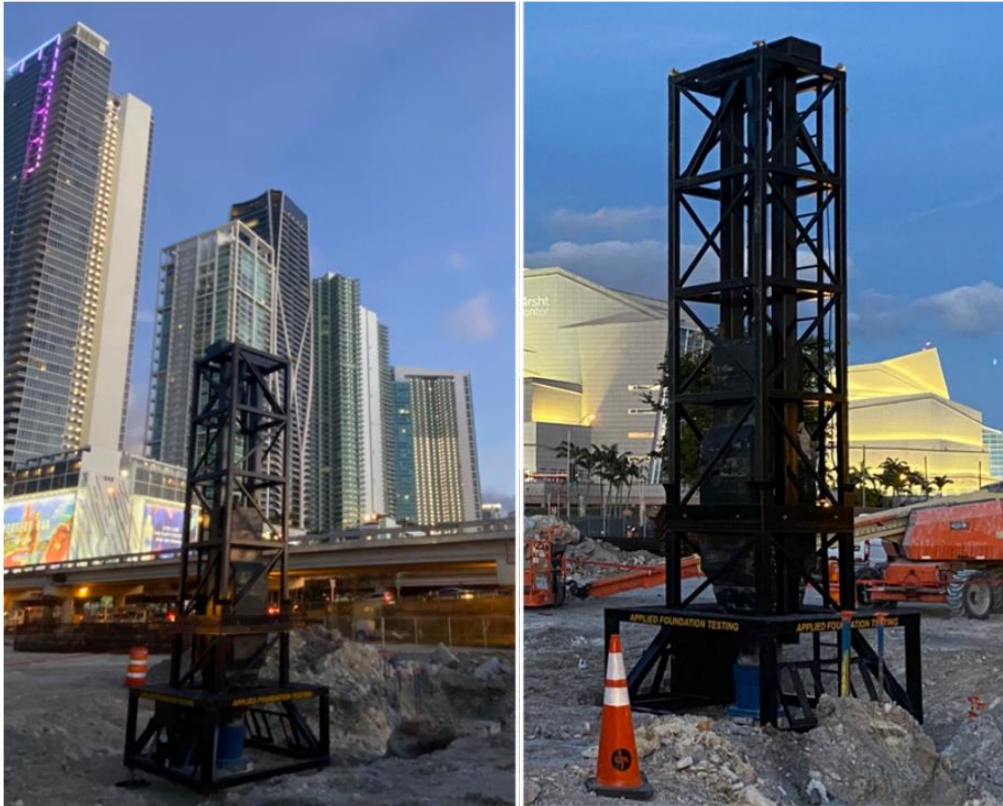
Drop hammer testing performed by Applied Foundation Testing (AFT, 2020)
